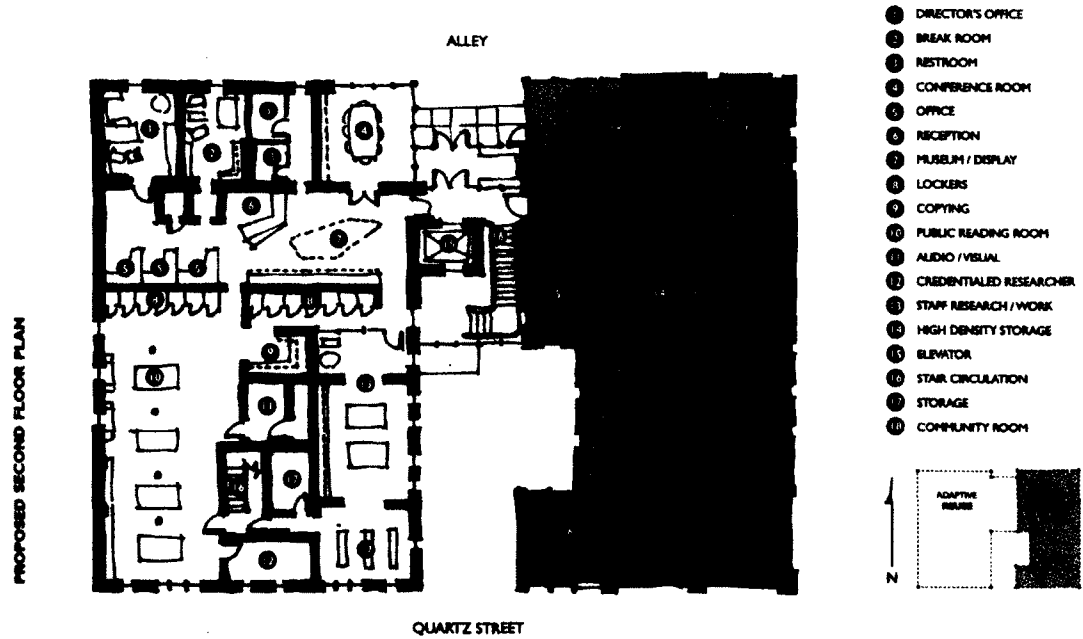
Proposed Second Floor Plan. Courtesy of Butte-Silver Bow Archives.
